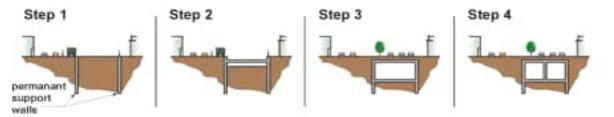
Top-down Cut and Cover Construction [P-65]
